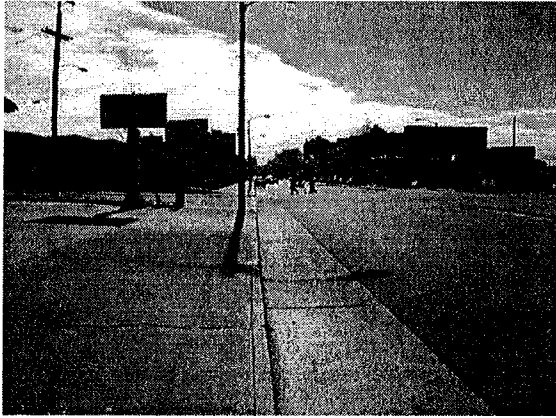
Adjacent parking lane of San Pablo Avenue, facing south.
